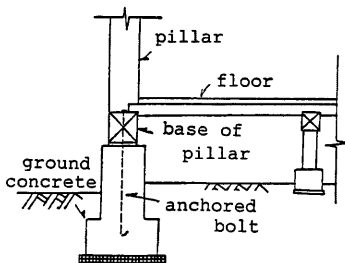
Example of base structure of typical contemporary Japanese-style wooden house
